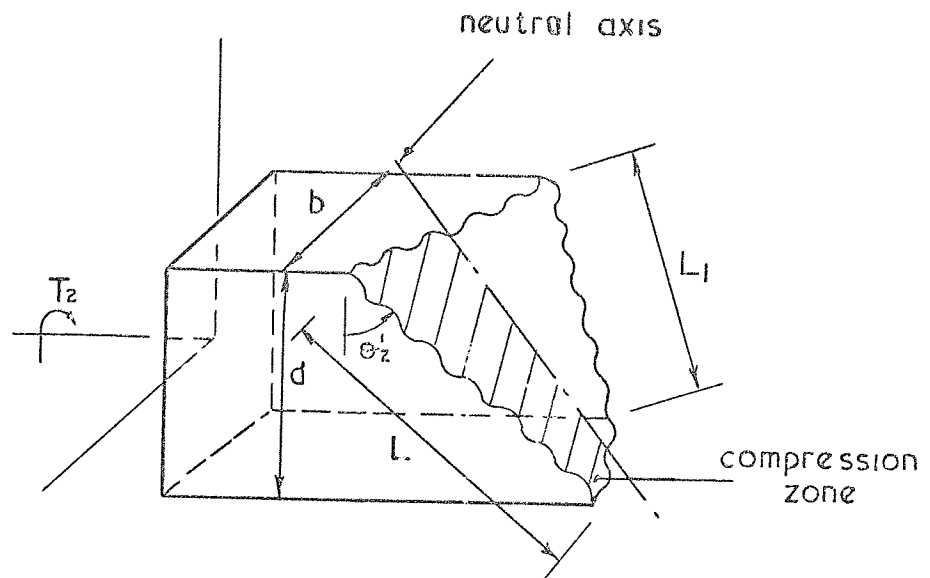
Mode 2 type of failure in plain concrete (distorted failure plane) rectangular cross section
